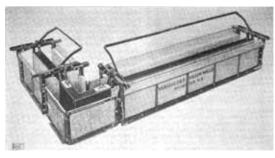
Van Guilder hollow-wall molds set for construction of a corner of a building⁶
